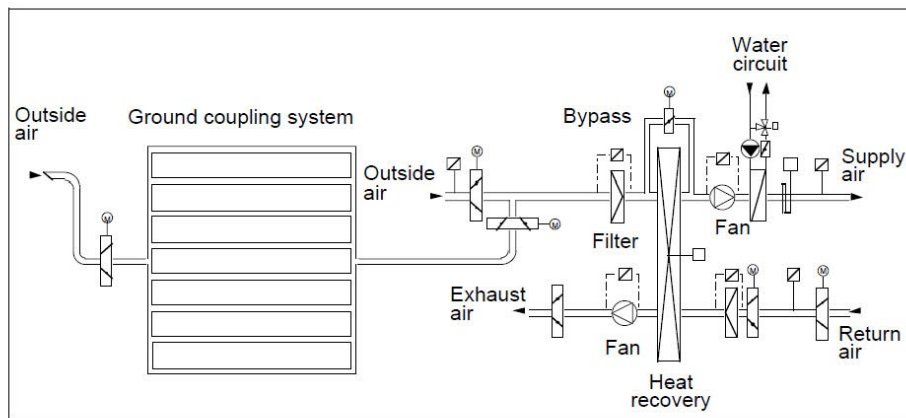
Schwerzenbacherhof building - Schematic of the ground coupled and ventilation systems (Hollmuller, 2002).
